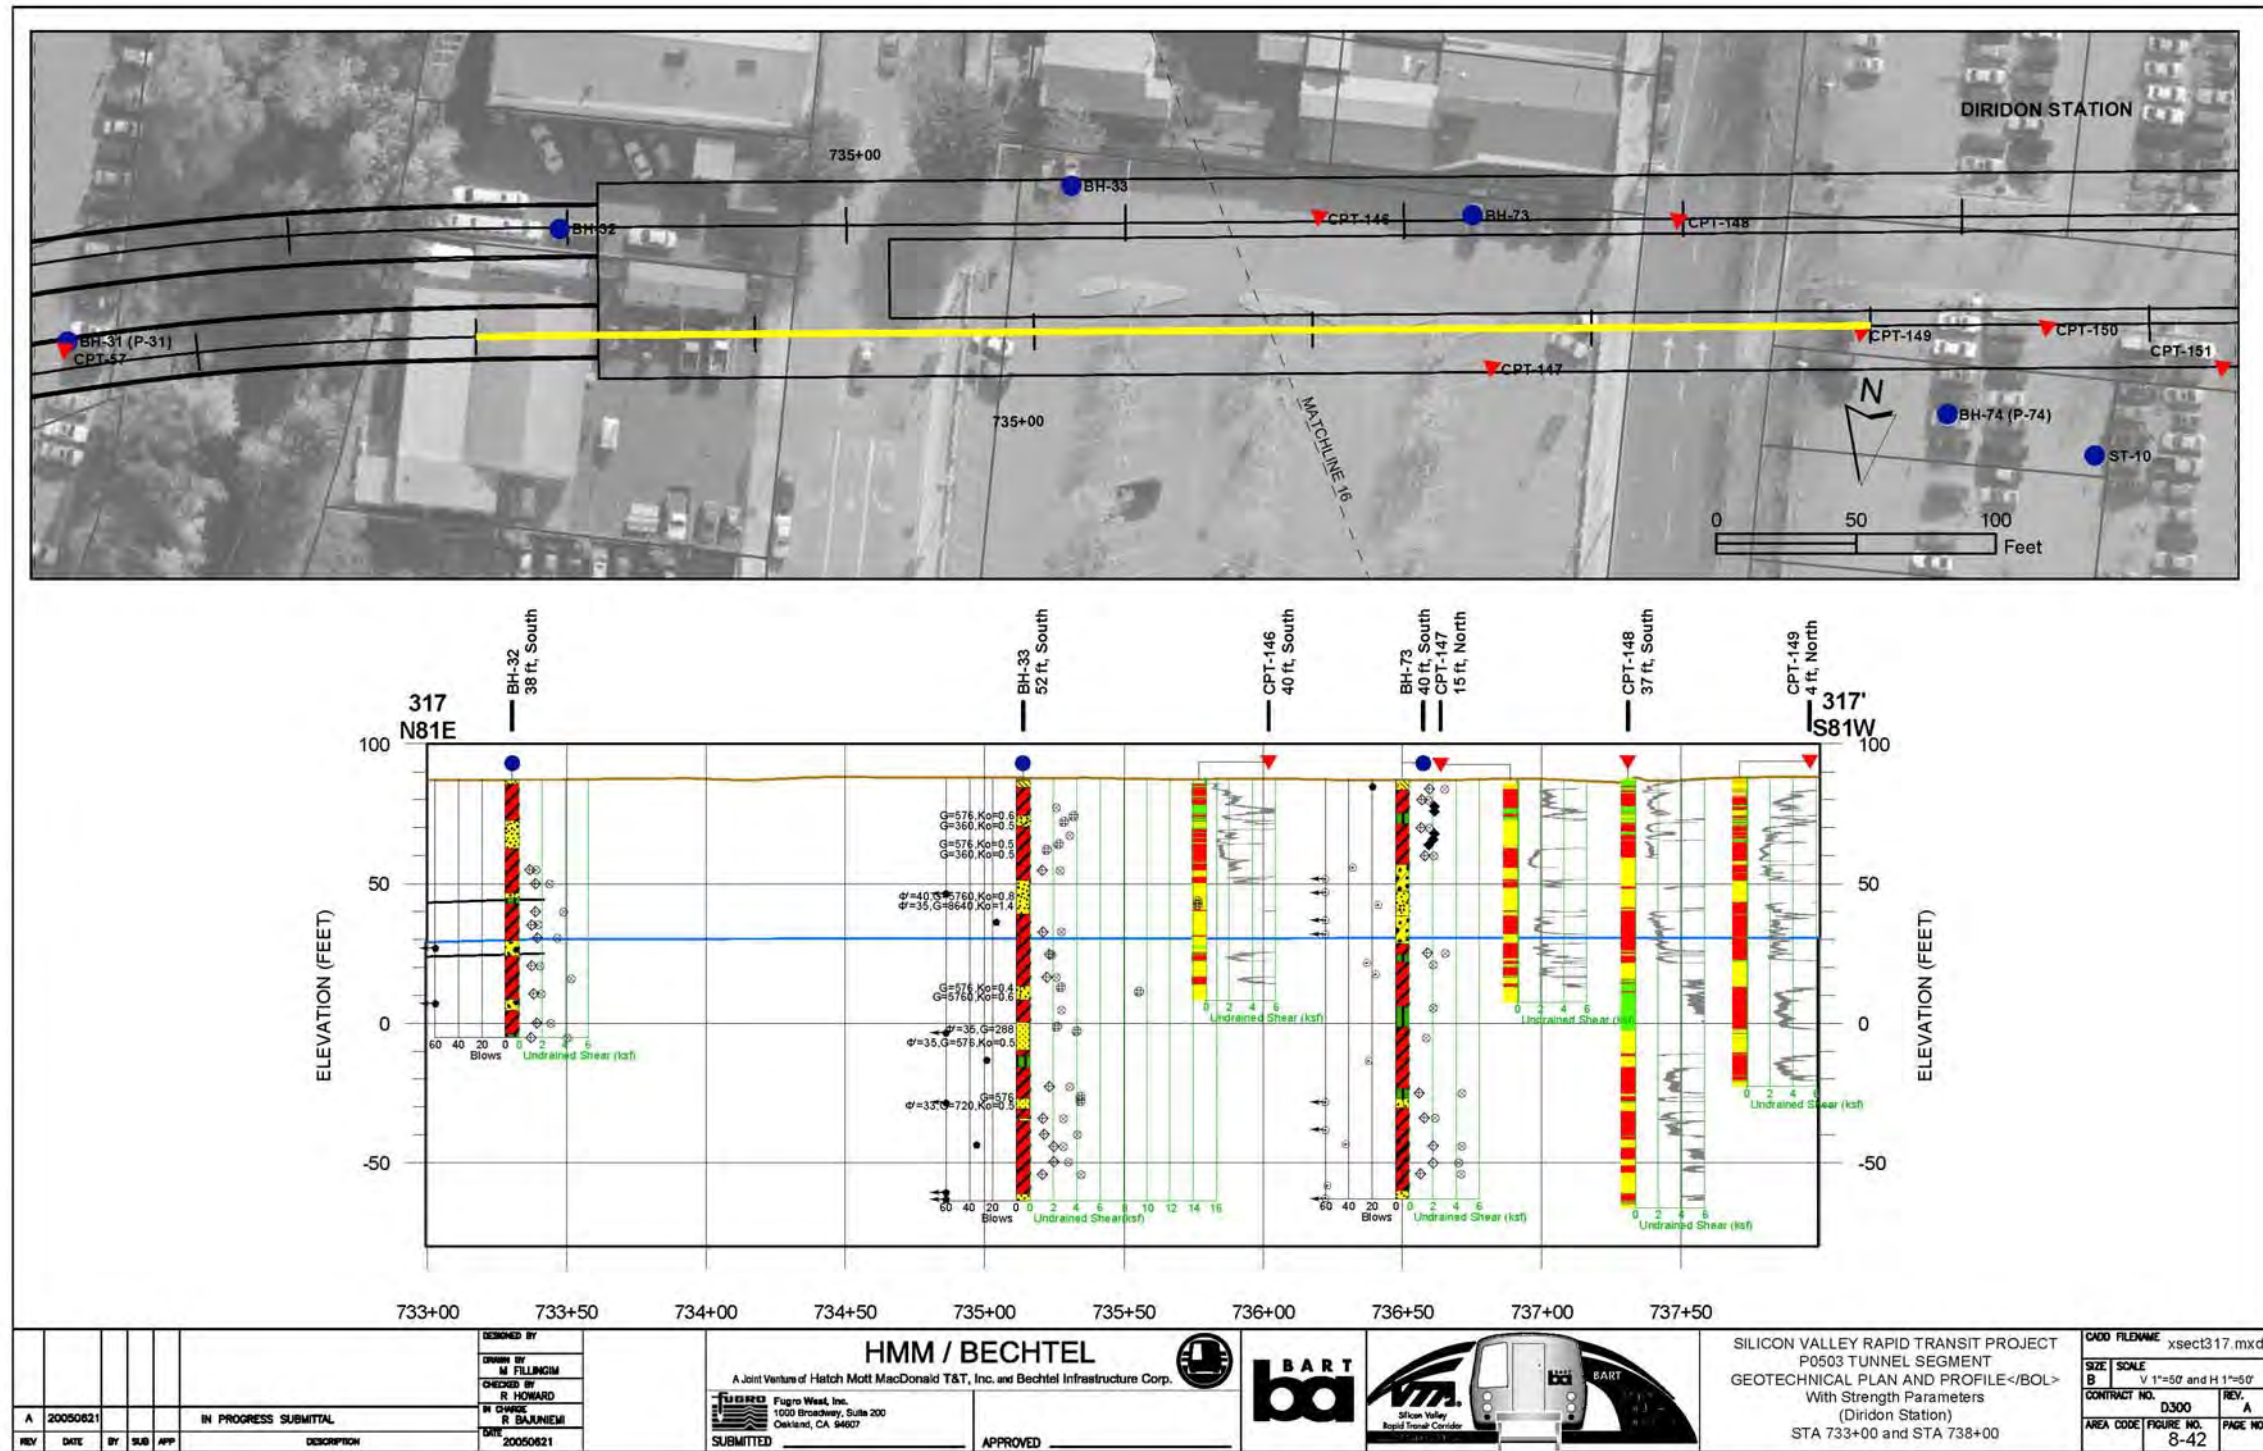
Geotechnical Plan and Profile with Strength Parameters: 733+00 to 738+00.
